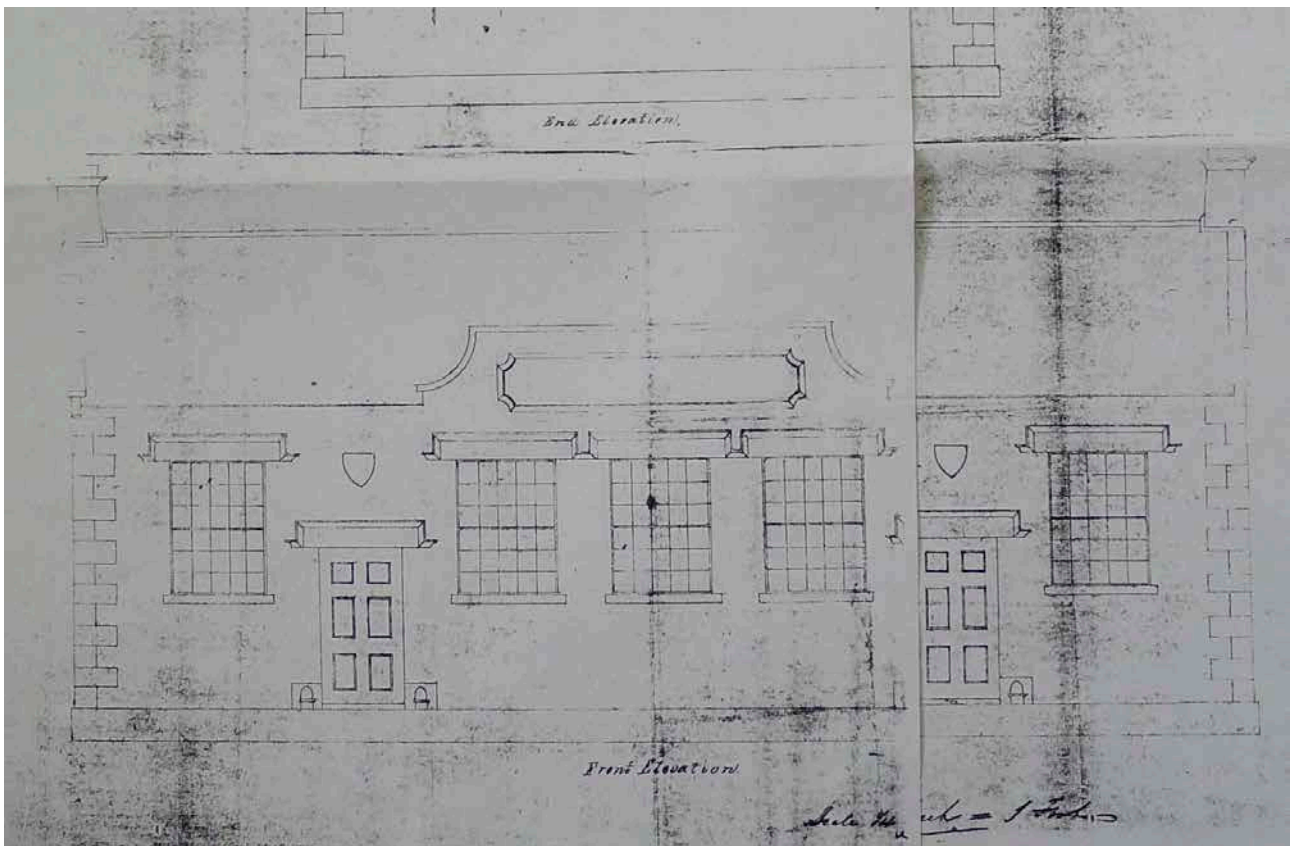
Drawing of the south elevation of the British School, Station Street. [Courtesy of Dianne Howe]
